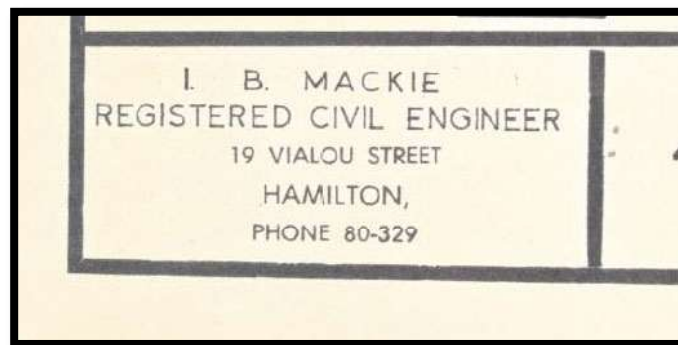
Structural Engineer's credentials – as taken from the engineer's drawings
